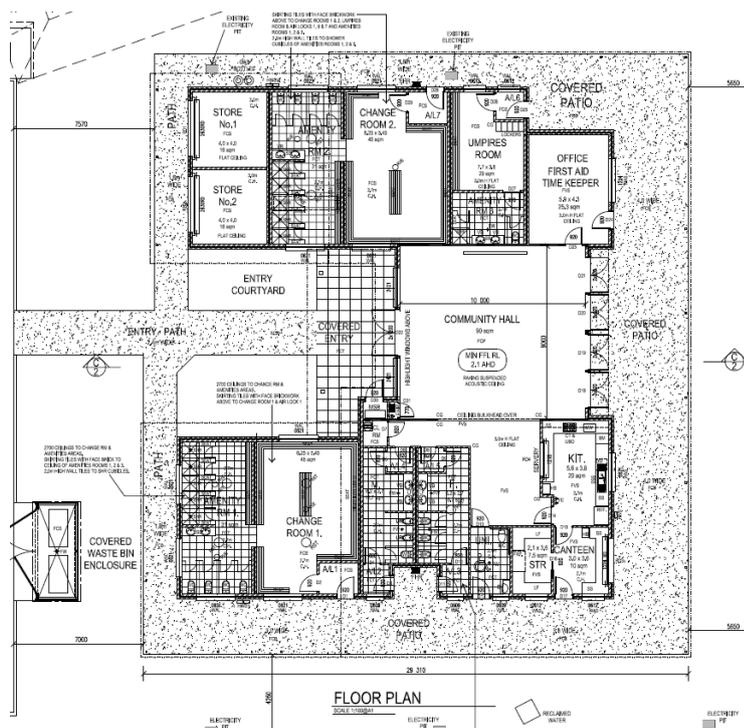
Indicative Combined Sporting Amenities and Community Facility Floor Plan
